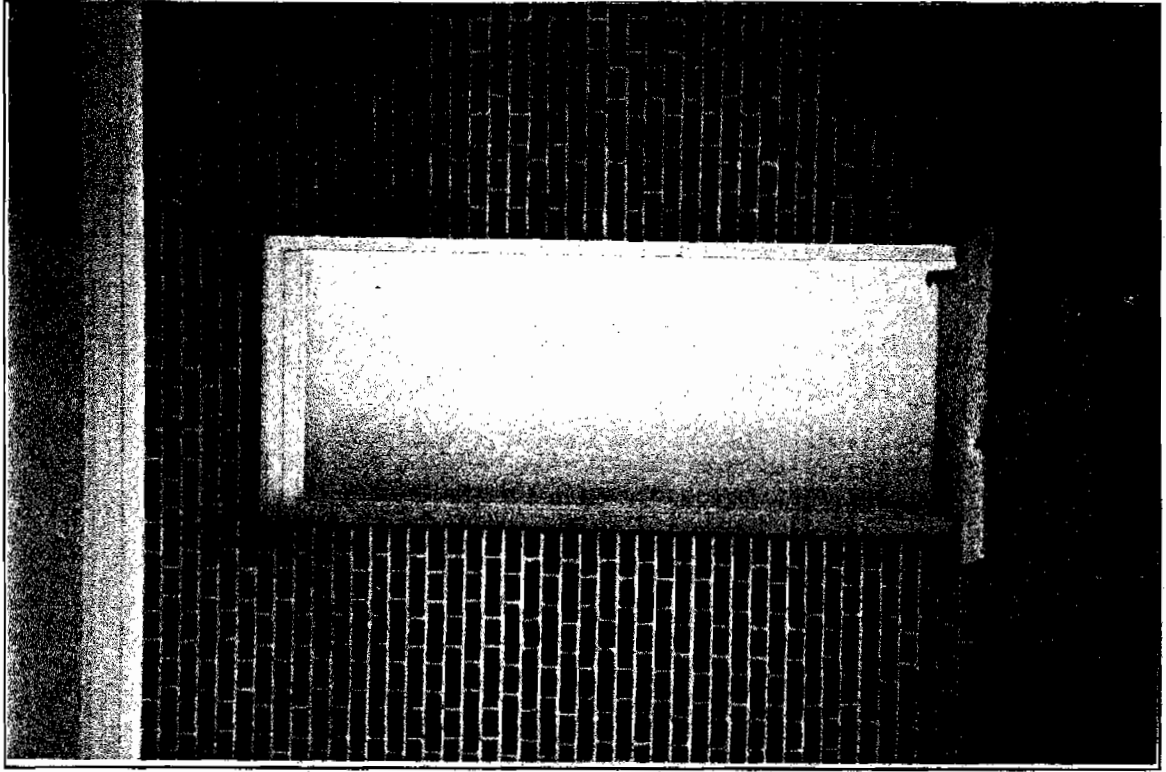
An unused exhaust fan has become a nesting site – interior wall construction is visible from the exterior.
